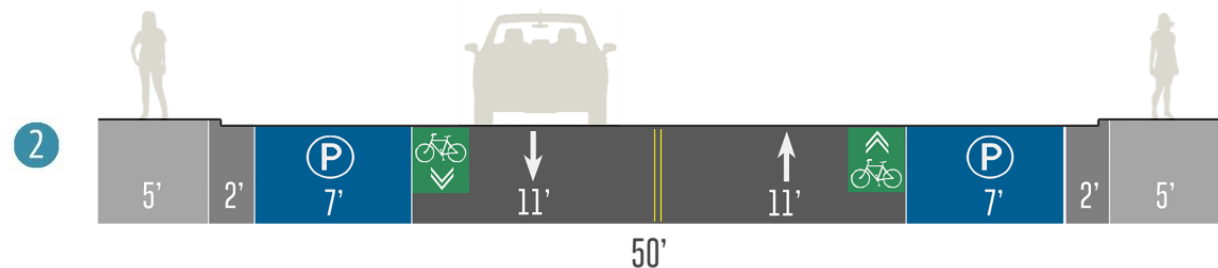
11th Street Bicycle and Pedestrian Corridor Potential Typical Section from West Avenue to Ocean Drive
